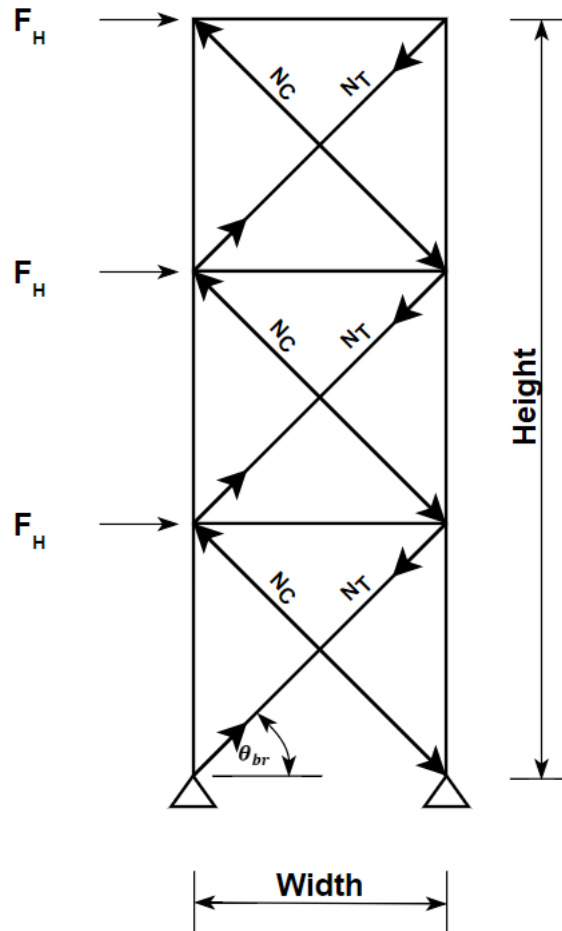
Diagram of Typical 2-D Structural Model with Vertical Cross-Bracing
